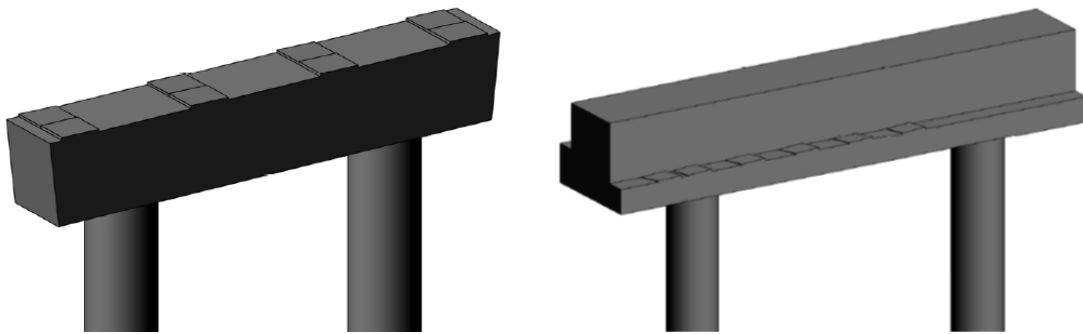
a) Rectangular Bent Pier b) Inverted T Bent Pier
